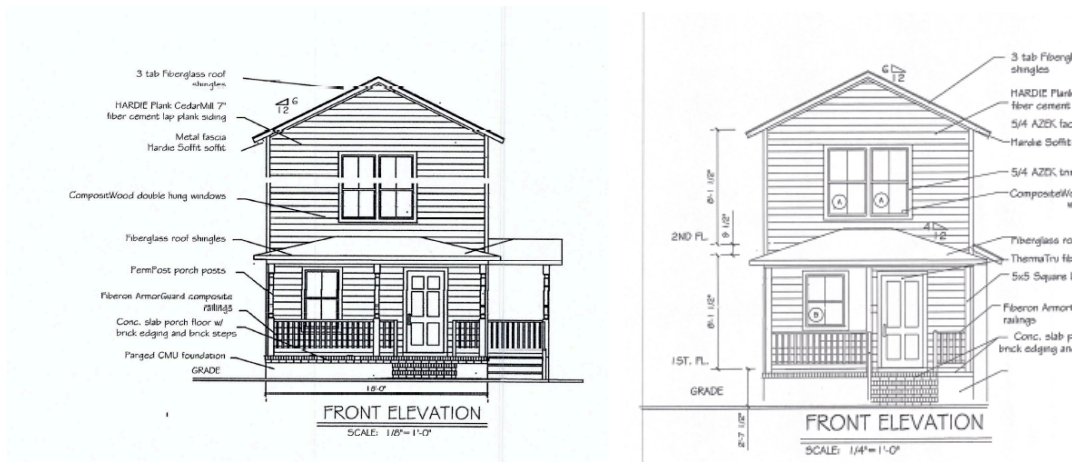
Approved Building Plans 108 S Locust Lane and 310 South Street
